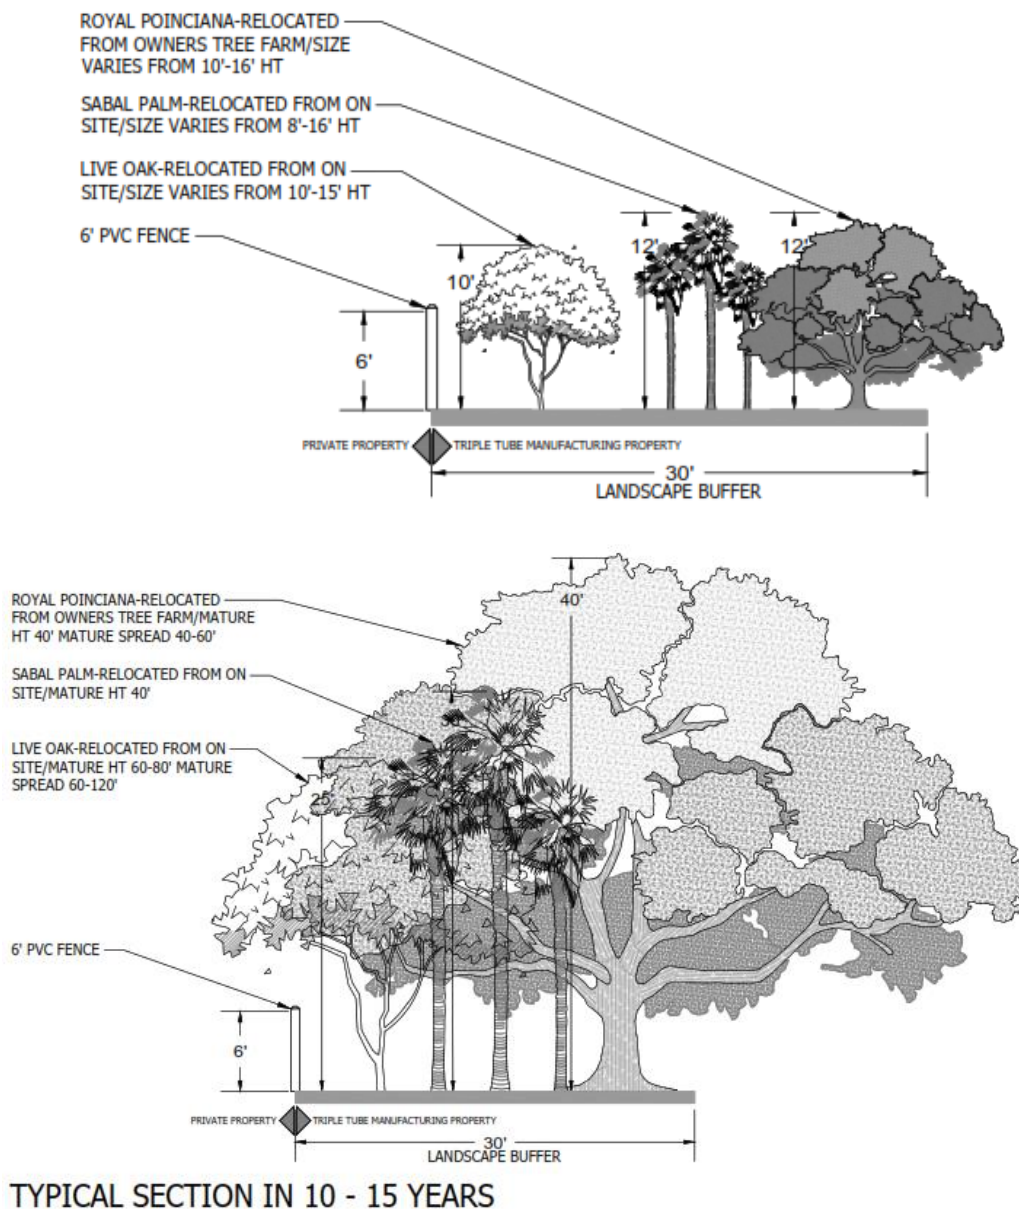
Sheet 2 of 2 PD Plan – PROPOSED PLANTINGS IN THE BUFFER – TYPICAL SECTIONS
